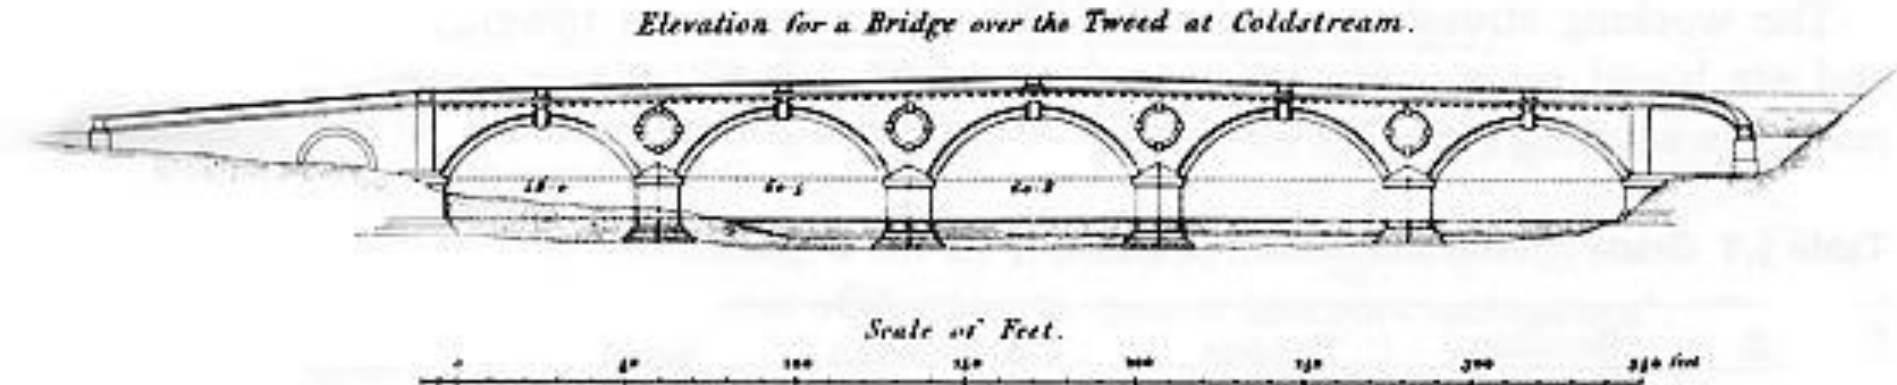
Elevation of masonry Bridge over the Tweed at Coldstream, 1866 (Irwin and Sibbald, 1983)
